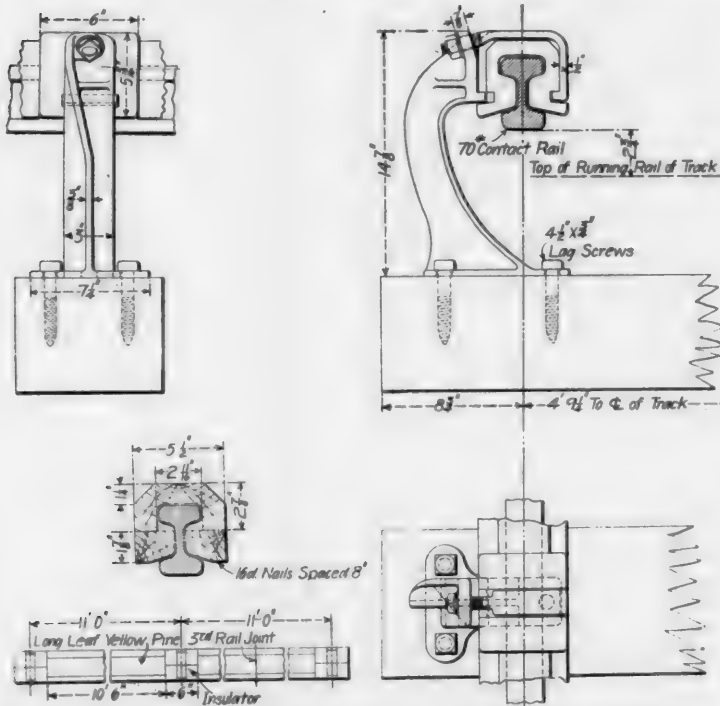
DETAIL OF SUPPORTING BRACKETS AND WOOD PROTECTION, NEW YORK CENTRAL TYPE OF THIRD-RAIL.
